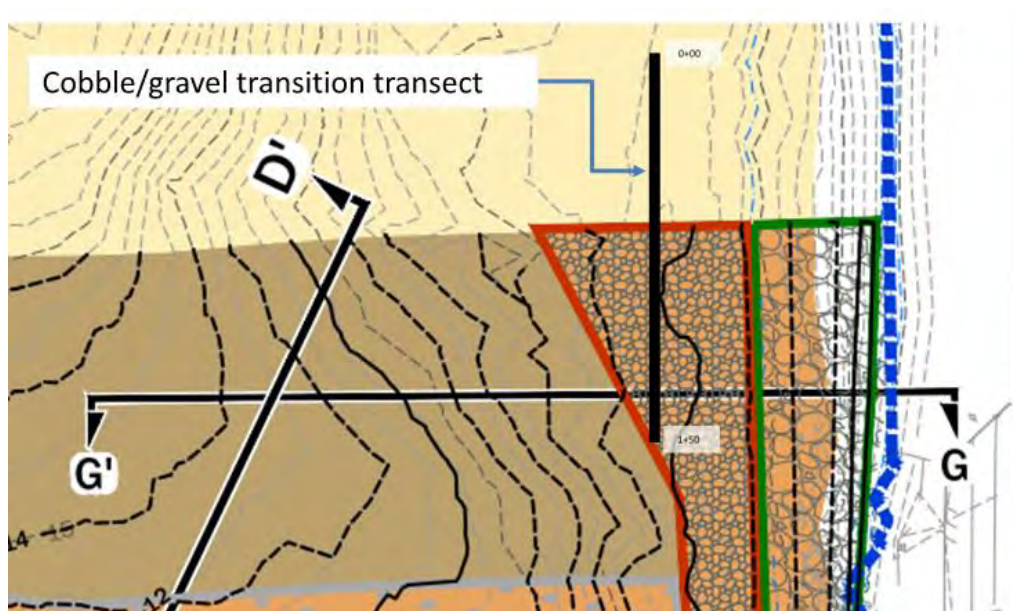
Plan view showing transect location used to describe north transition of protection layers to existing bathymetry for R.G. Haley project
